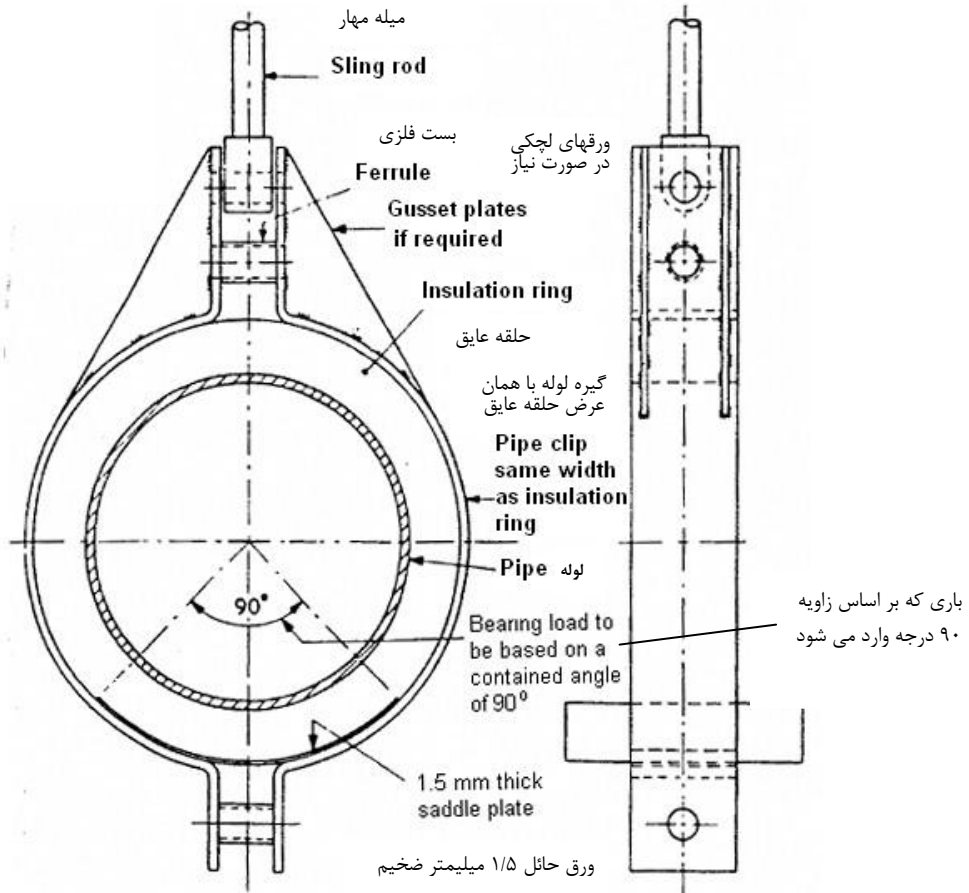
TWO-PIECE STRAP USING INSULATING RING
